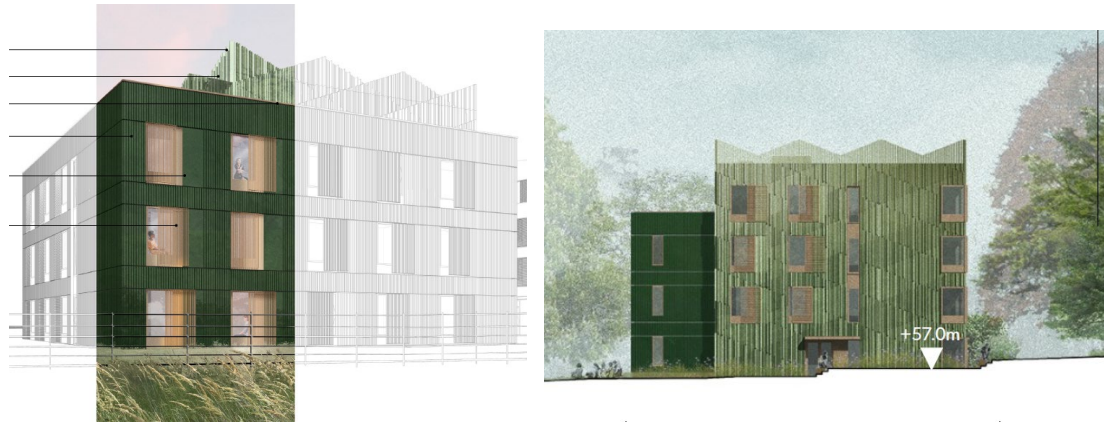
the architectural response for the Meadow building and visualisation of the south elevation (DAS extract)
